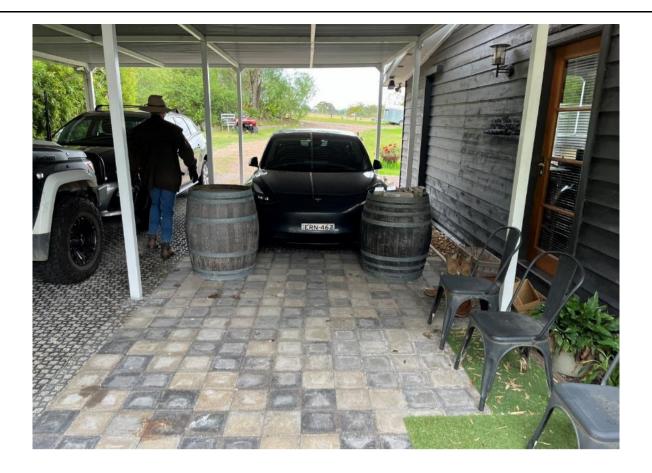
Residential dwelling (Dwelling 2) in central western portion of lot (facing south).
